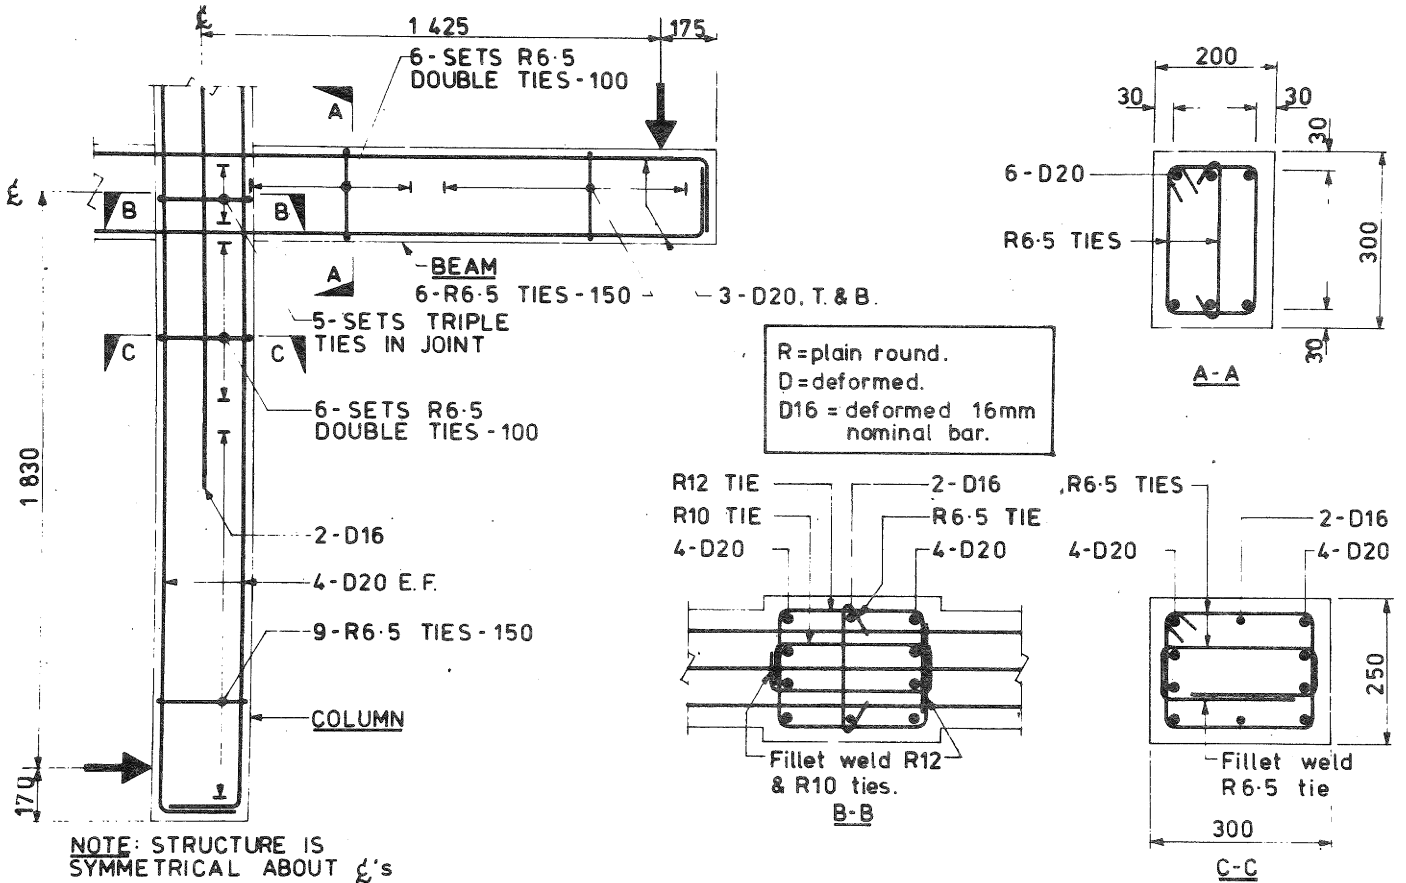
(a): REINFORCEMENT DETAILS FOR THE FOUR SPECIMENS (a) UNIT 1
